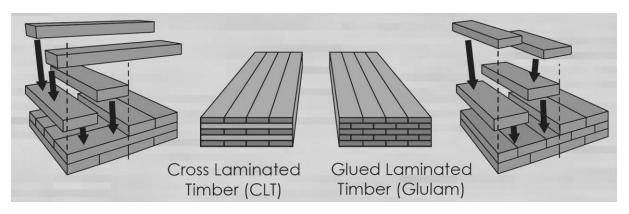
What is Cross Laminated Timber (CLT)/ Glued Laminated Timber (Glulam) (BuildableDesign 2017)
